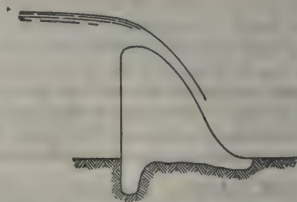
Typical Solid Gravity Spillway Masonry Section
